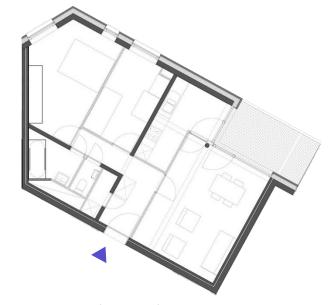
Floor plan of a 2-room flat in Candries Source: LPP Architectes
